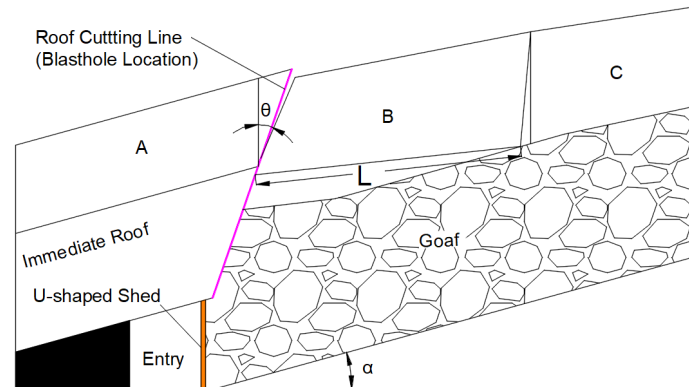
Roof structure of gob-side entry retaining by roof cutting (GERRC).
